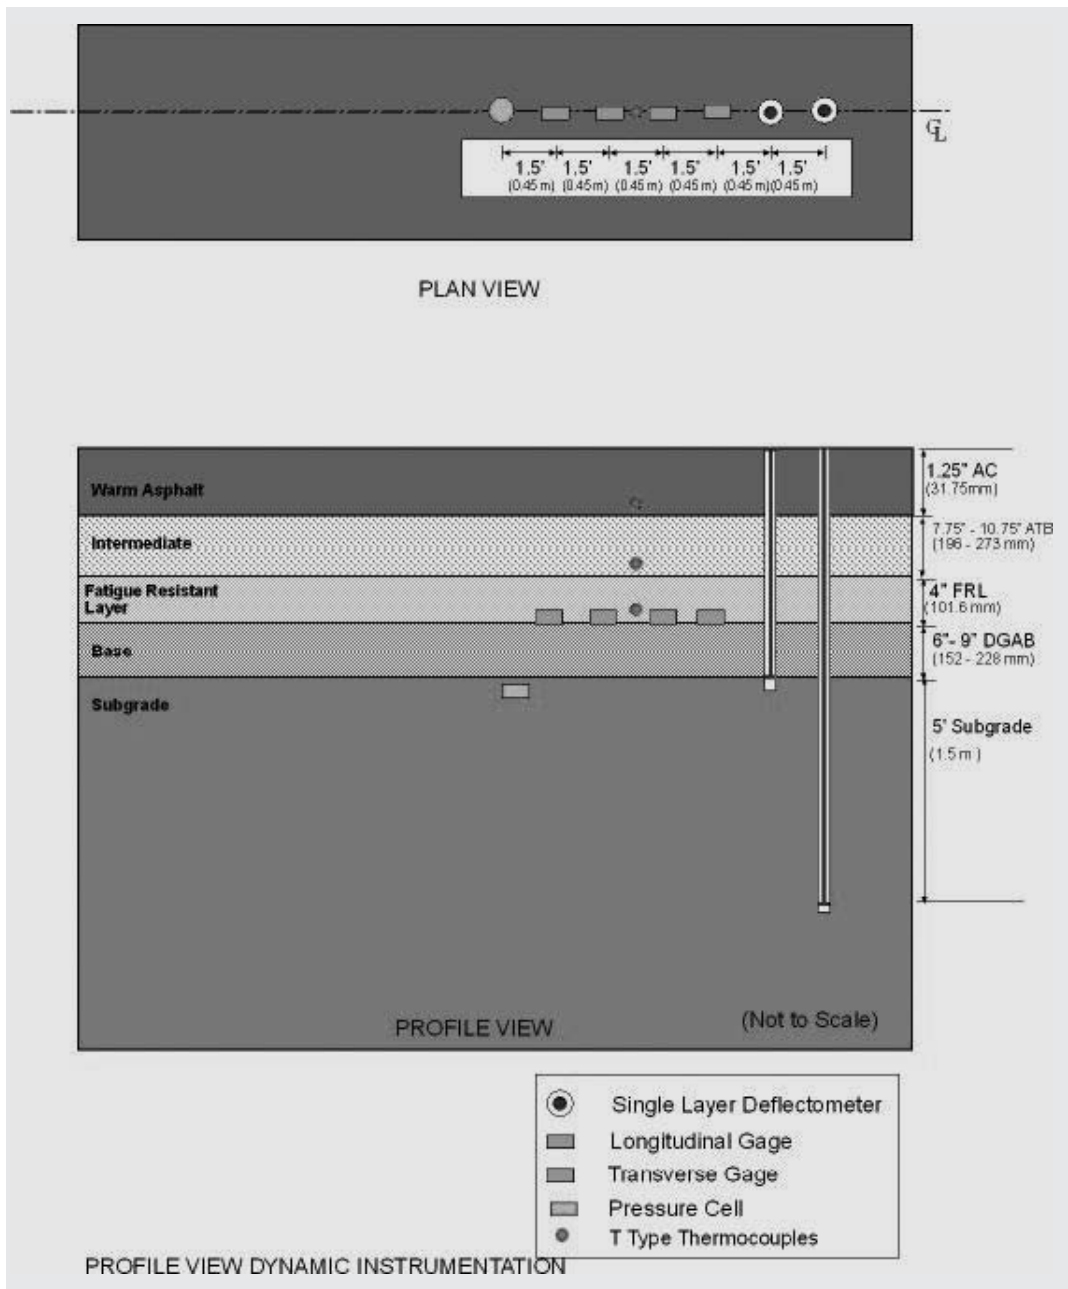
Shown on the left are plan and profile views of APLF instrumentation for Warm Asphalt Perpetual Pavement.
